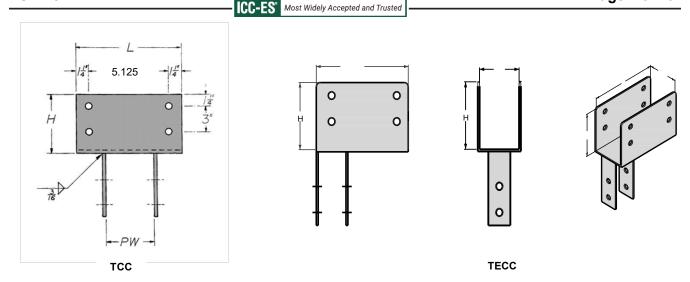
TYPICAL TCC and TECC COLUMN CAP CONNECTORS
